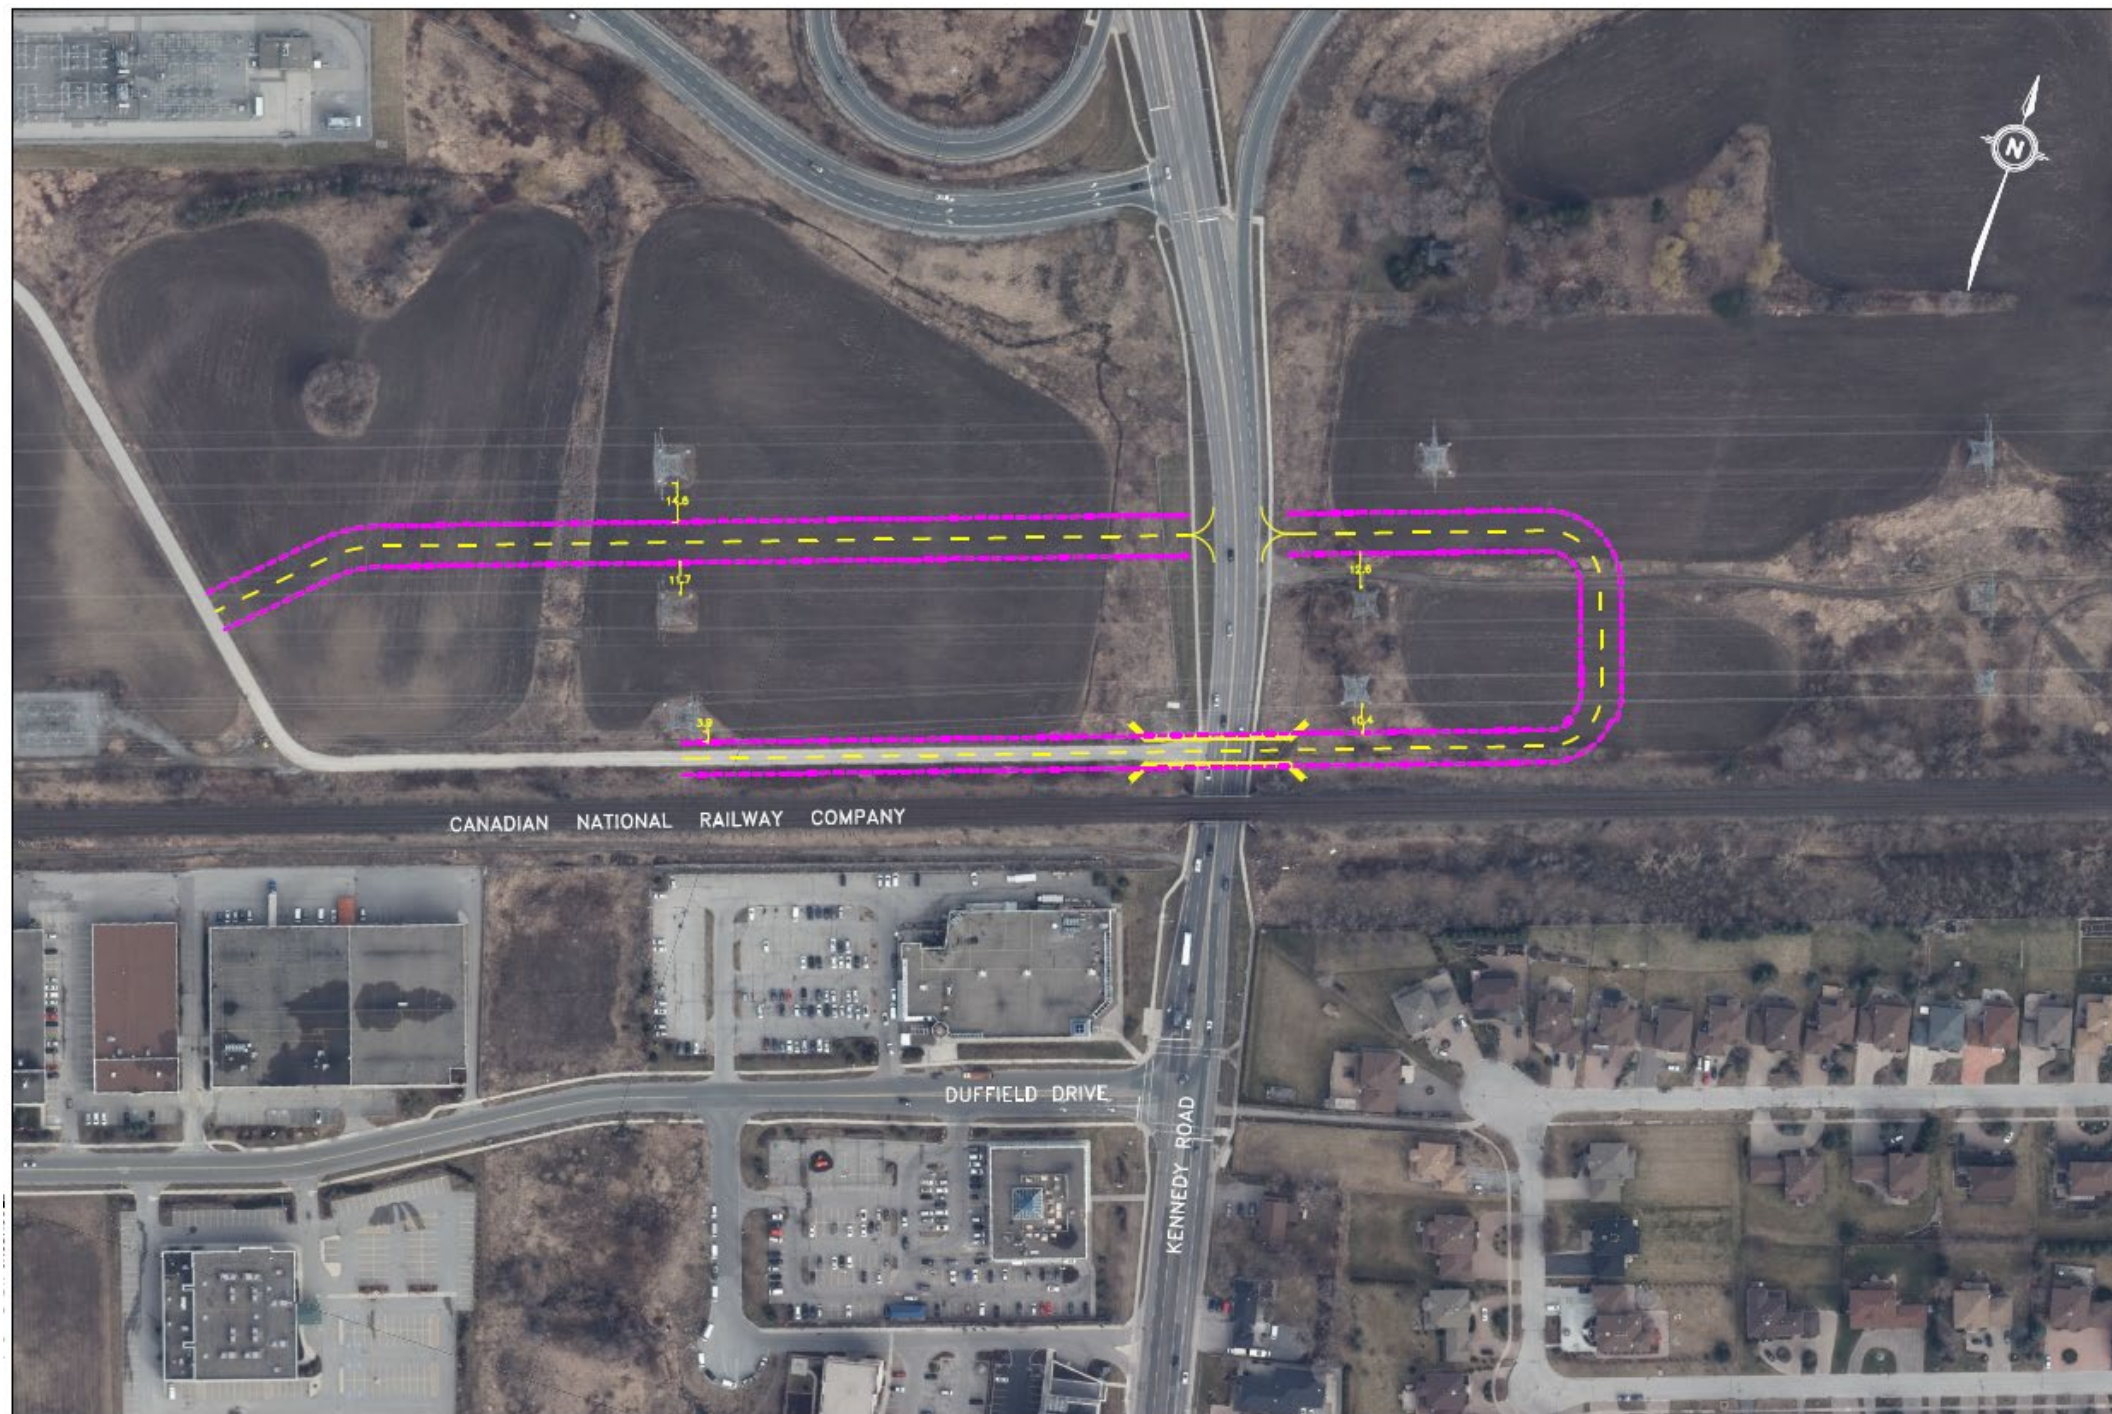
Alternative 3, Buttonhook with New Bridge
